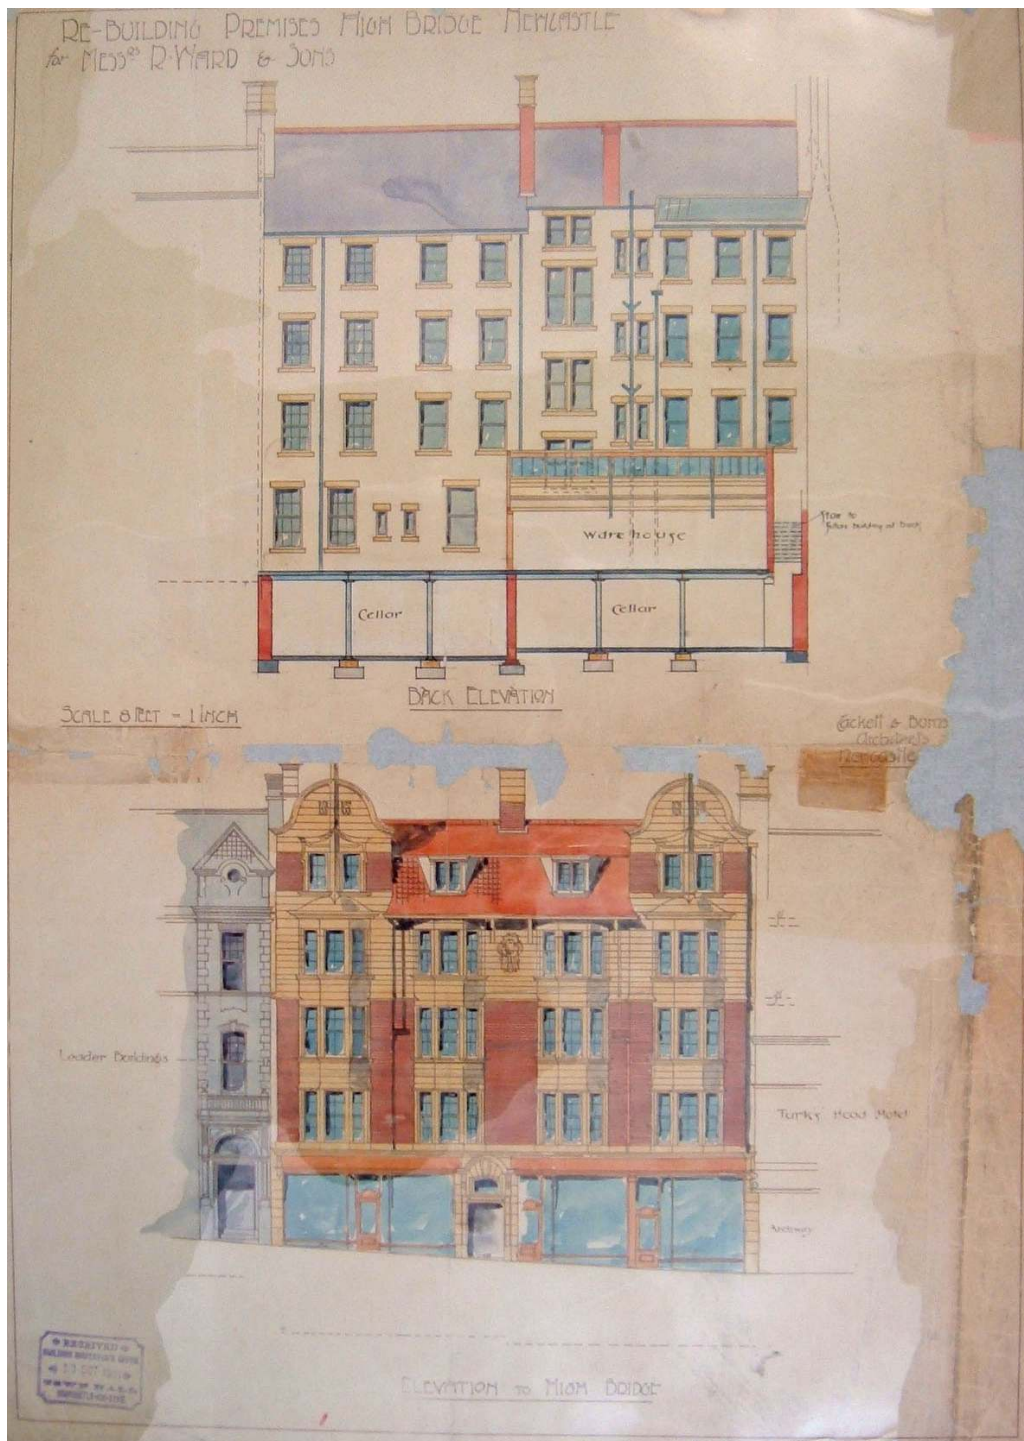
Elevations for proposed rebuilding of 1901, by Cackett and Burns Dick.
